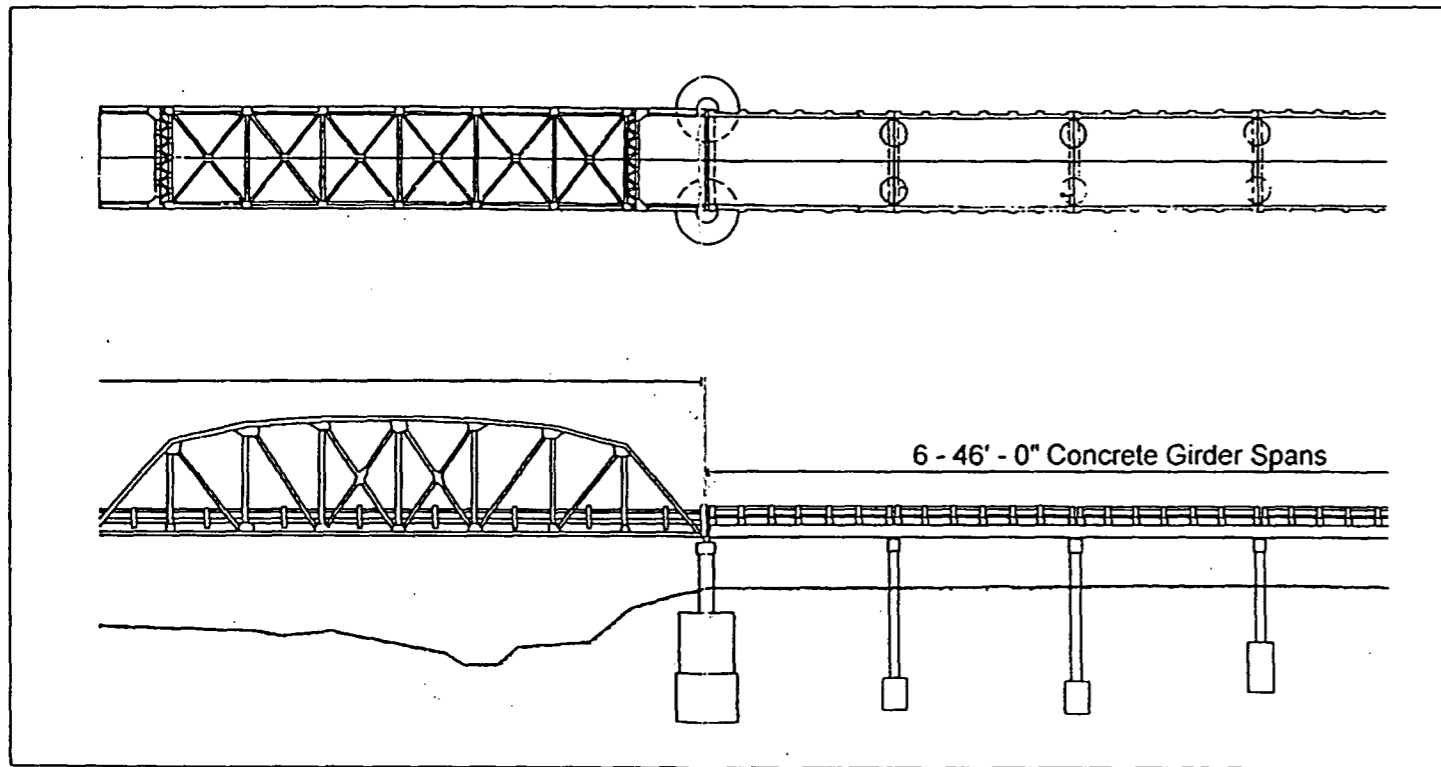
Elevation of the State Highway 3 Bridge at the Nueces River as shown in the 1932 plans.
